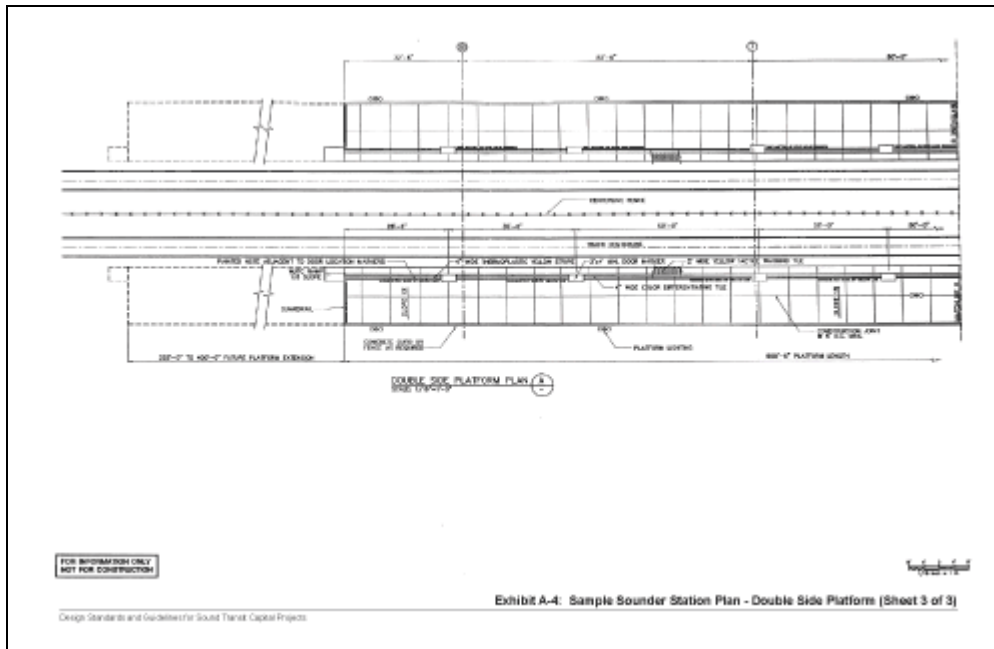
Sample Sounder Station Plan – Double Side Platform (Sheet 3 of 3)
